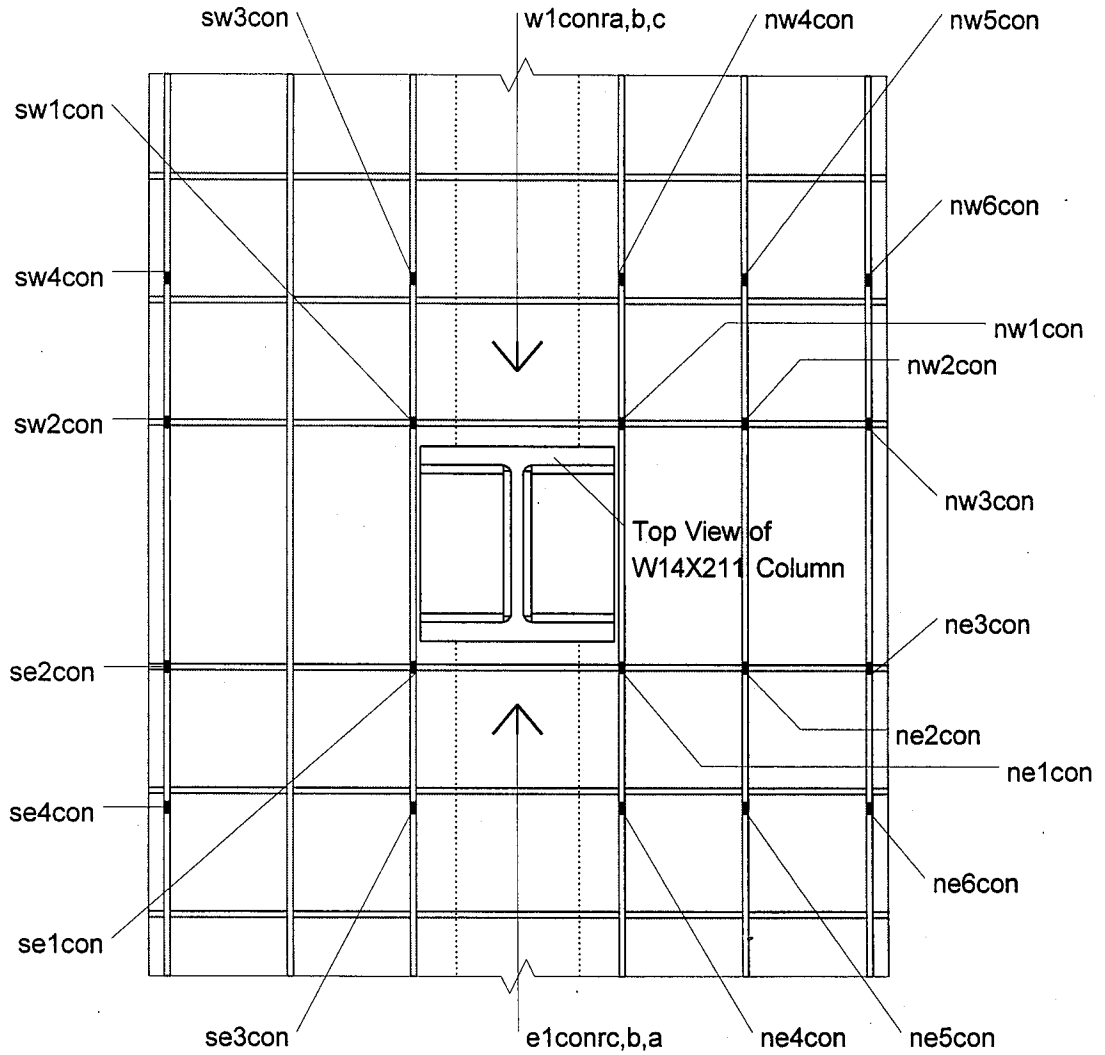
Strain Gages of Concrete Slab (Plan View)
